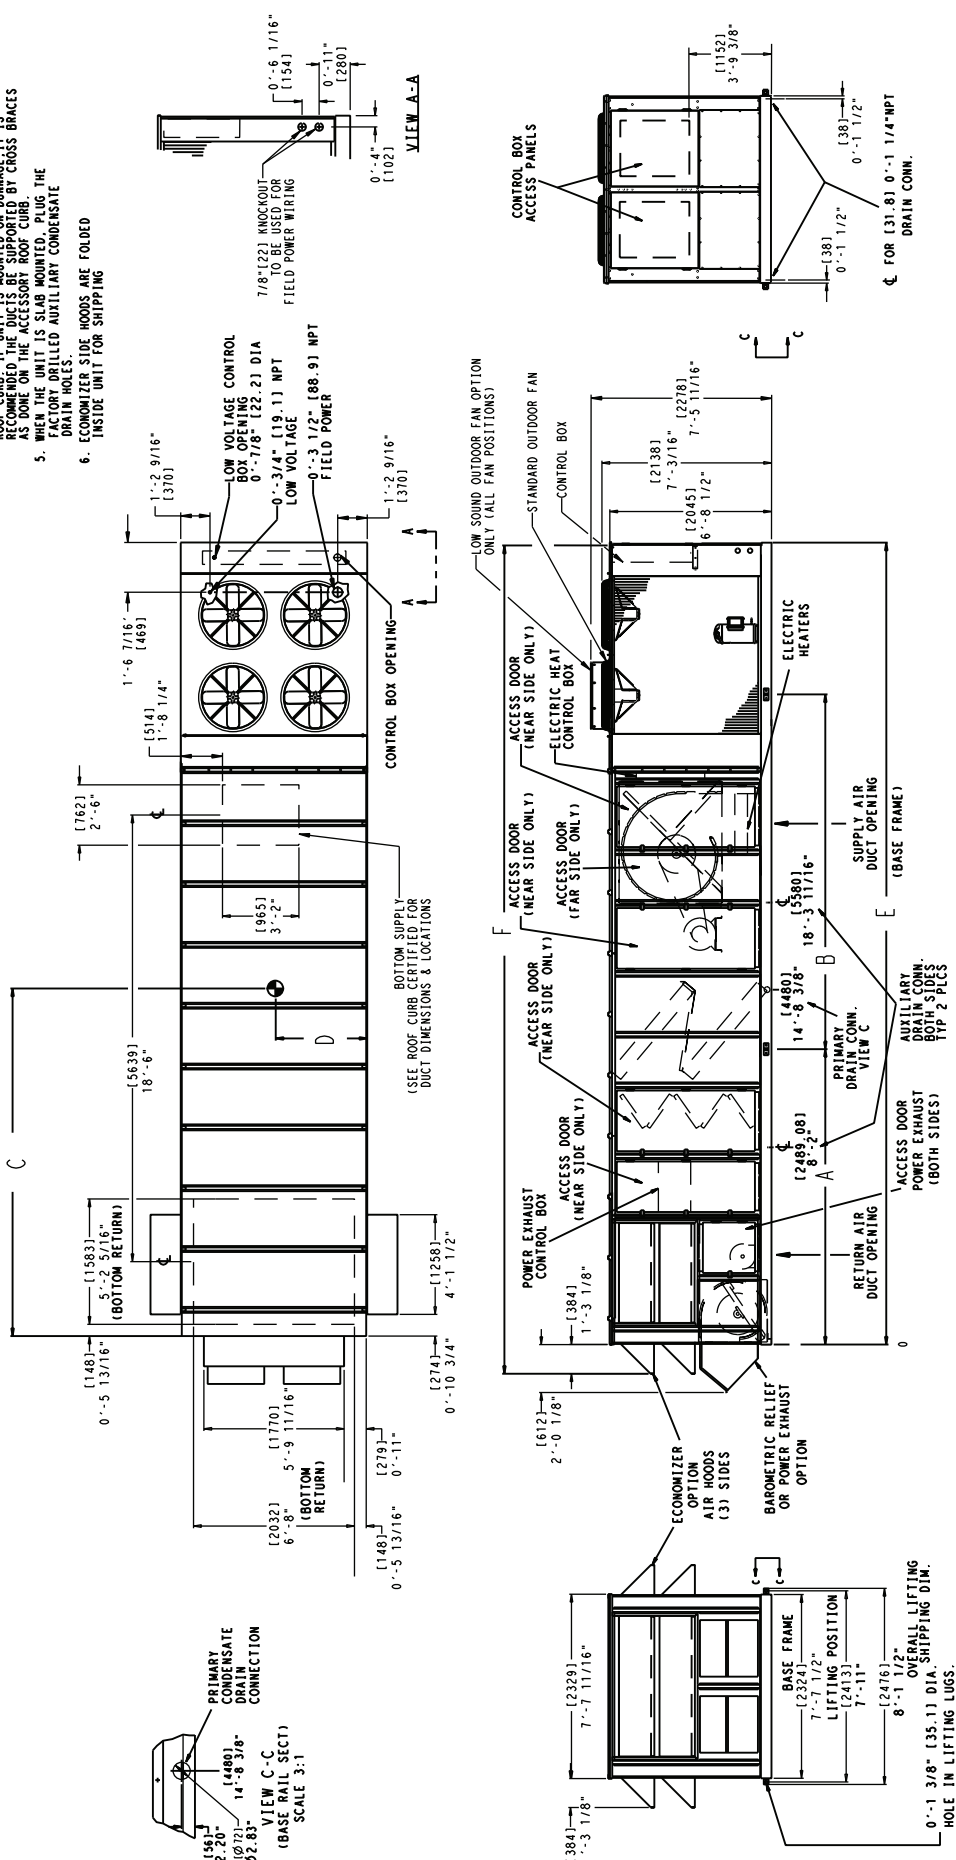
Base Unit Dimensional Drawing — 50P2, P3055,060 (Standard Chassis Unit Shown)
